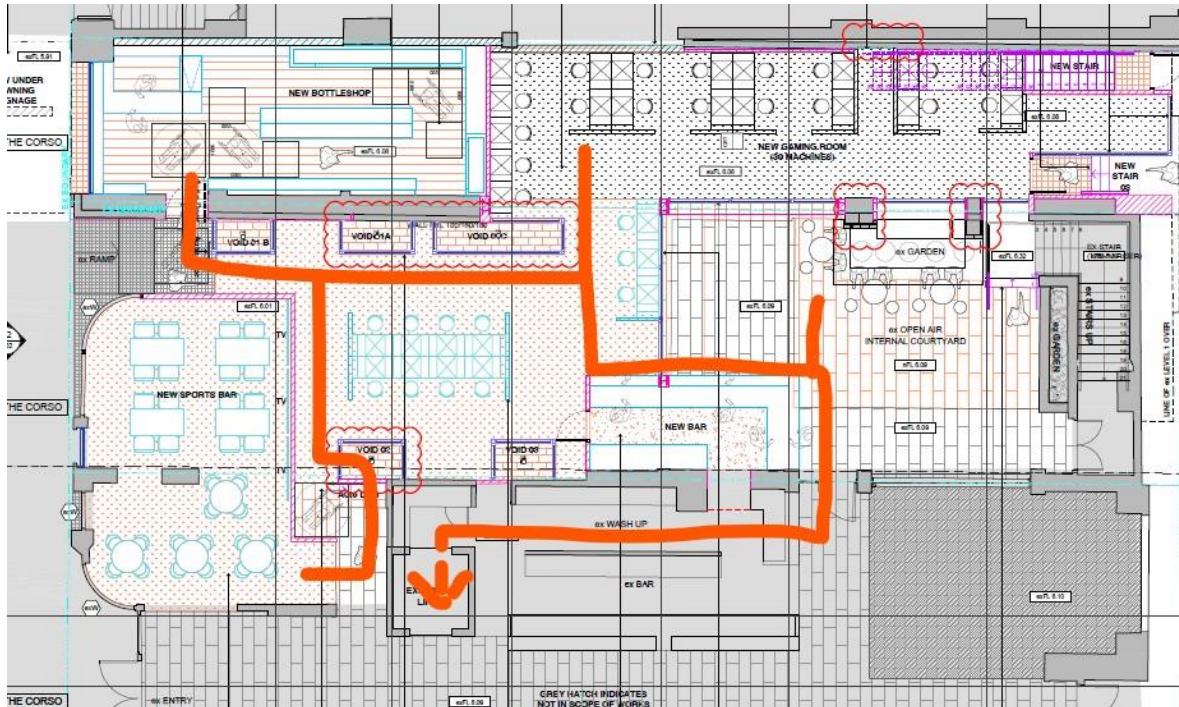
Ground Floor internal service bins waste transfer pathway through to the service lift leading to the Basement.
